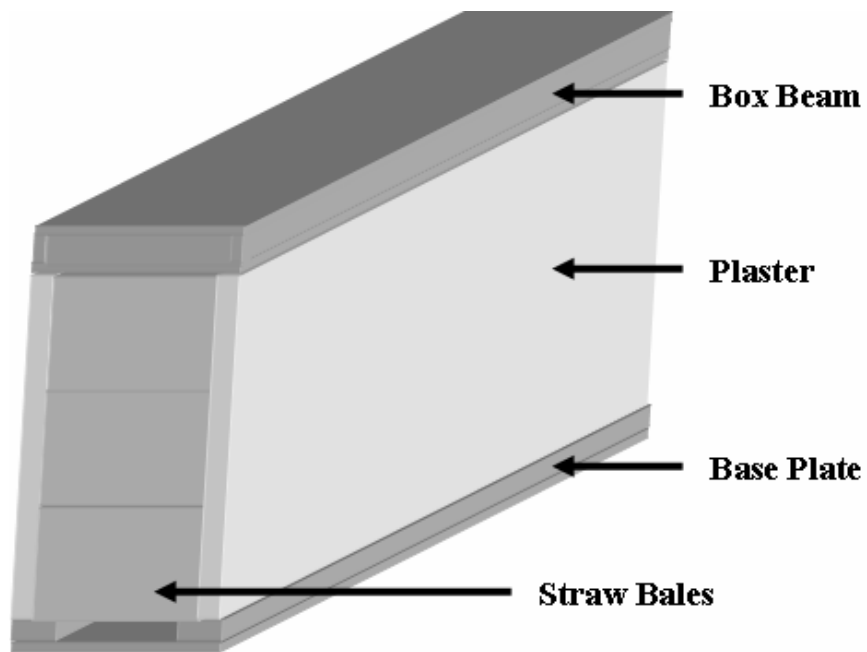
Simplified Typical Wall Details (Completed Wall)
